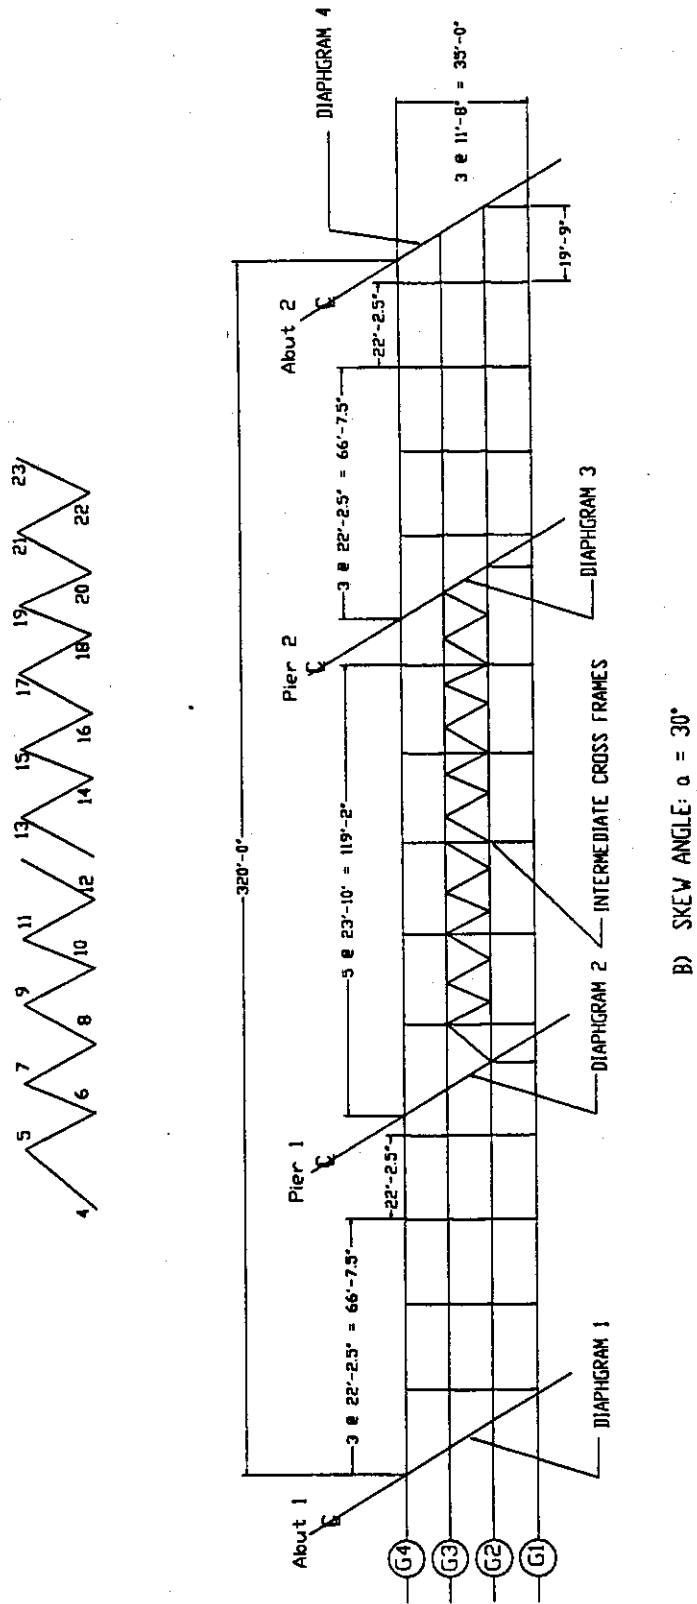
b Location of supports, diaphragms, intermediate cross frames, and lateral bracing of 30° skewed bridge.
